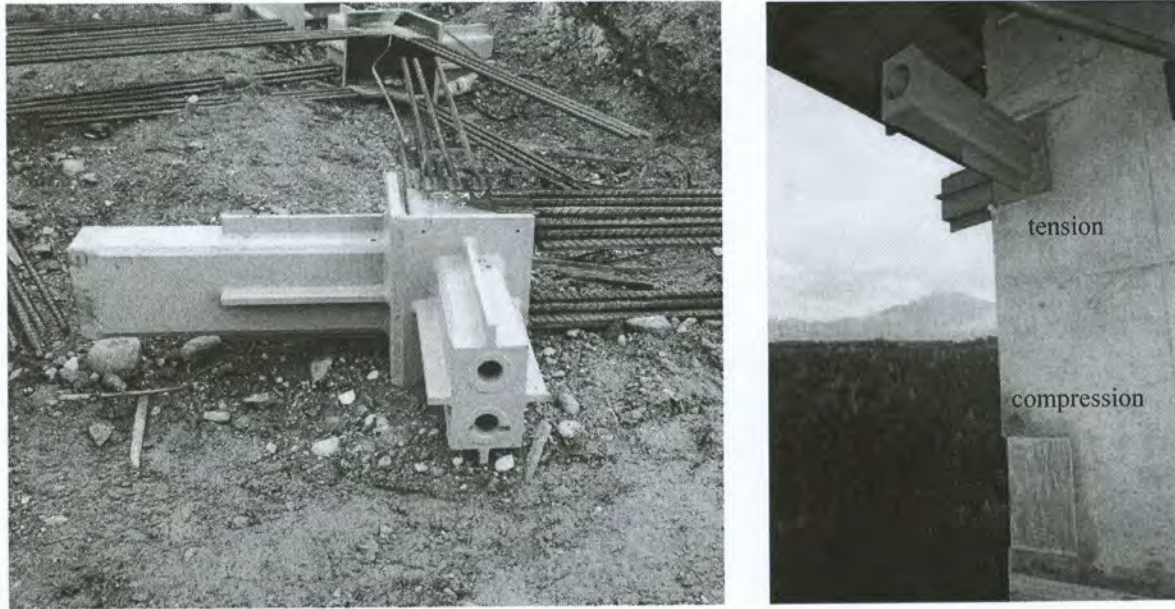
Prestressed bearing brackets for the steel frame docked to the concrete tower top
